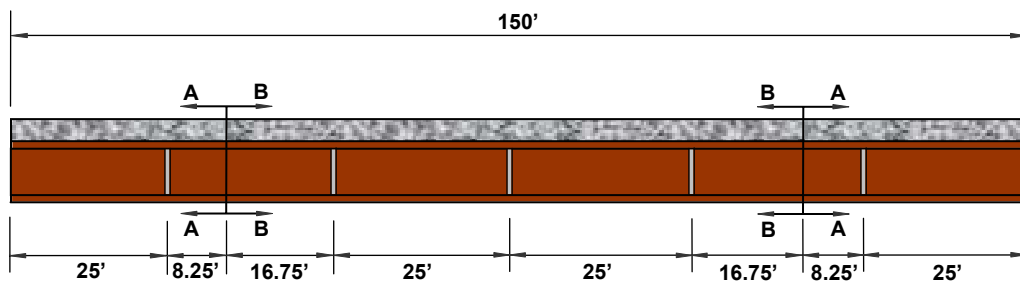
Plan view of Bakht bridge showing girder transitions and cross-frame locations
